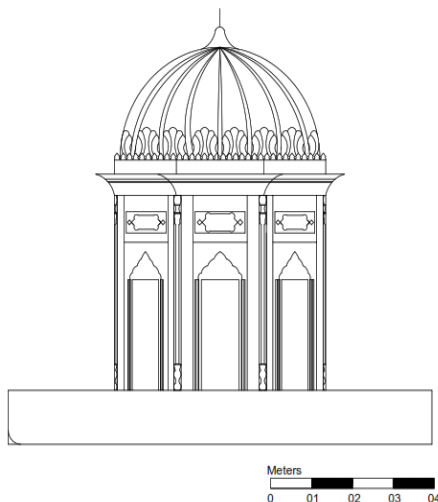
Front Elevation – Hindu Temple on Chakiah Road
